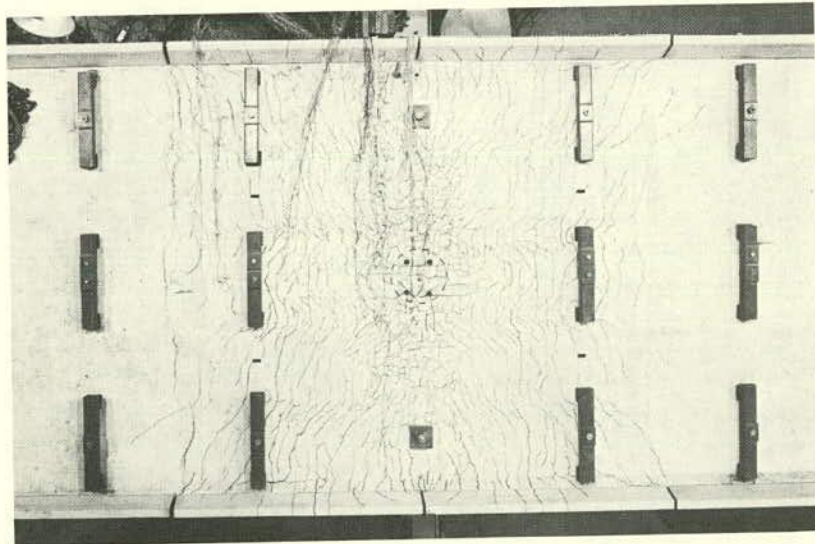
View of Crack Pattern in Roadway Slab Directly over the Column of Single-Column Model Bridge
